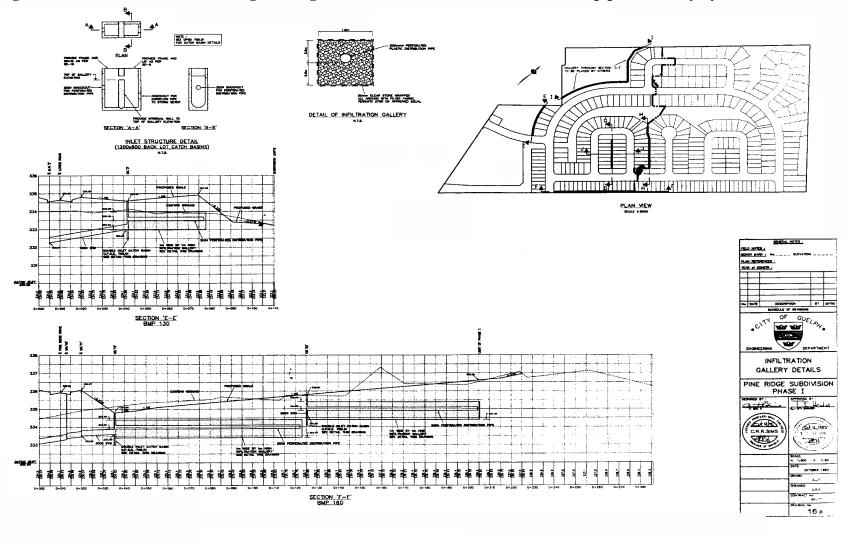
Plan and Profile Drawing showing the Construction Details for the End-of-pipe Greenway System
